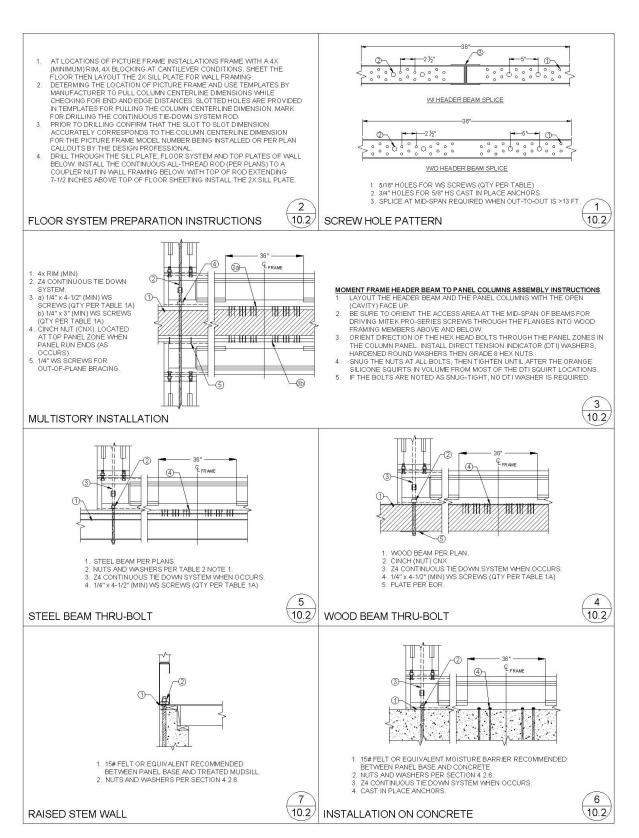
PICTURE FRAME INSTALLATION DETAILS
